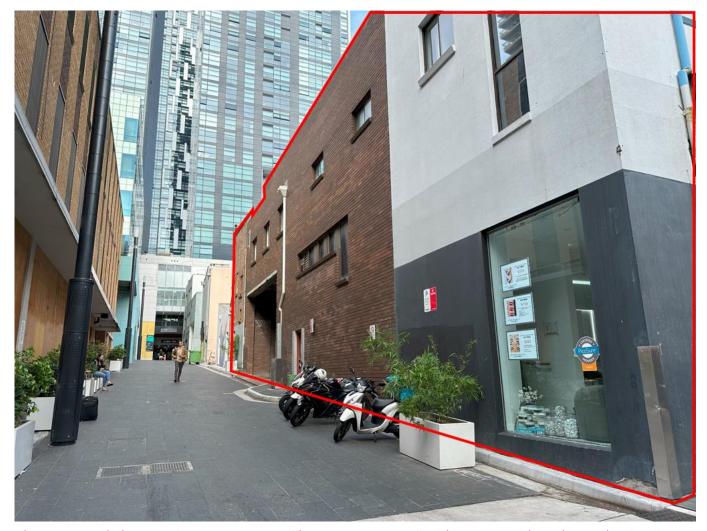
Existing Development to Post Office Lane Frontage (looking west, subject Site outlined red)
